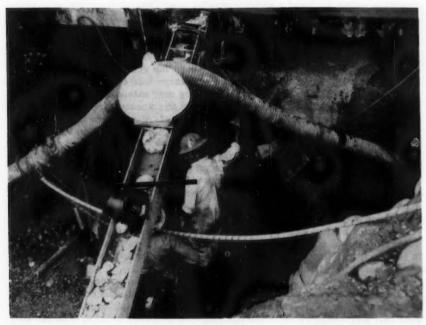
EXCAVATING FOR FOUNDATION OF EAST ABUTMENT OF ROCKY REACH PROJECT. A WALL OF GROUTED GRAVEL IS SHOWN ALONG LEFT SIDE OF PICTURE, ONE OF THE LARGE BOULDERS WHICH IMPEDED DRIVING SHEETING IS SHOWN IN THE RIGHT CENTER,
